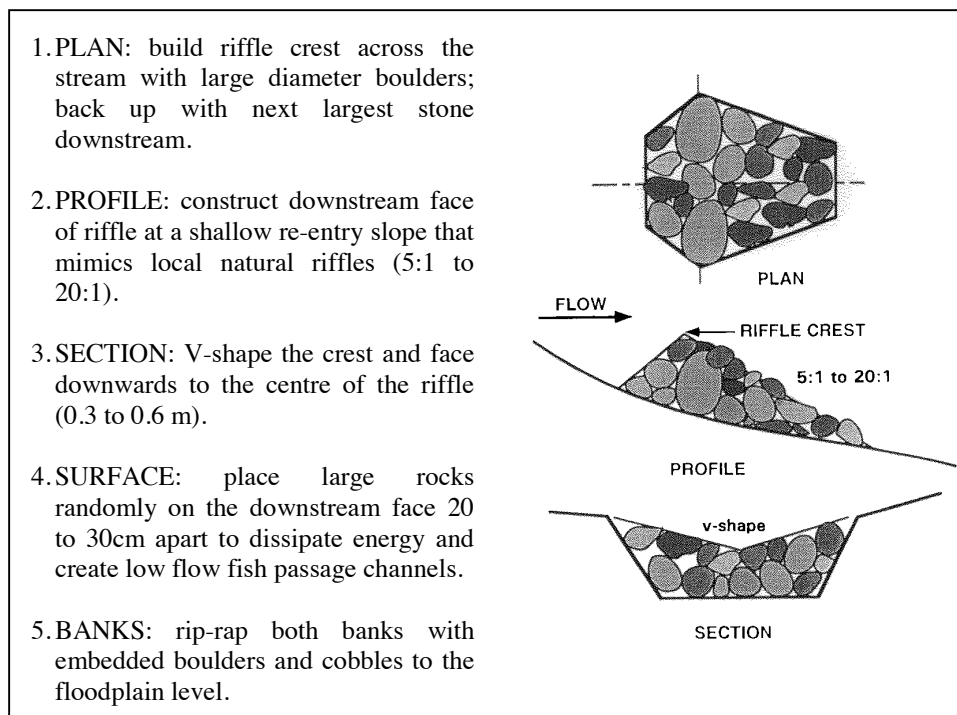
Example of construction drawings for machine operators to construct riffles (Newbury Hydraulics 1996)
